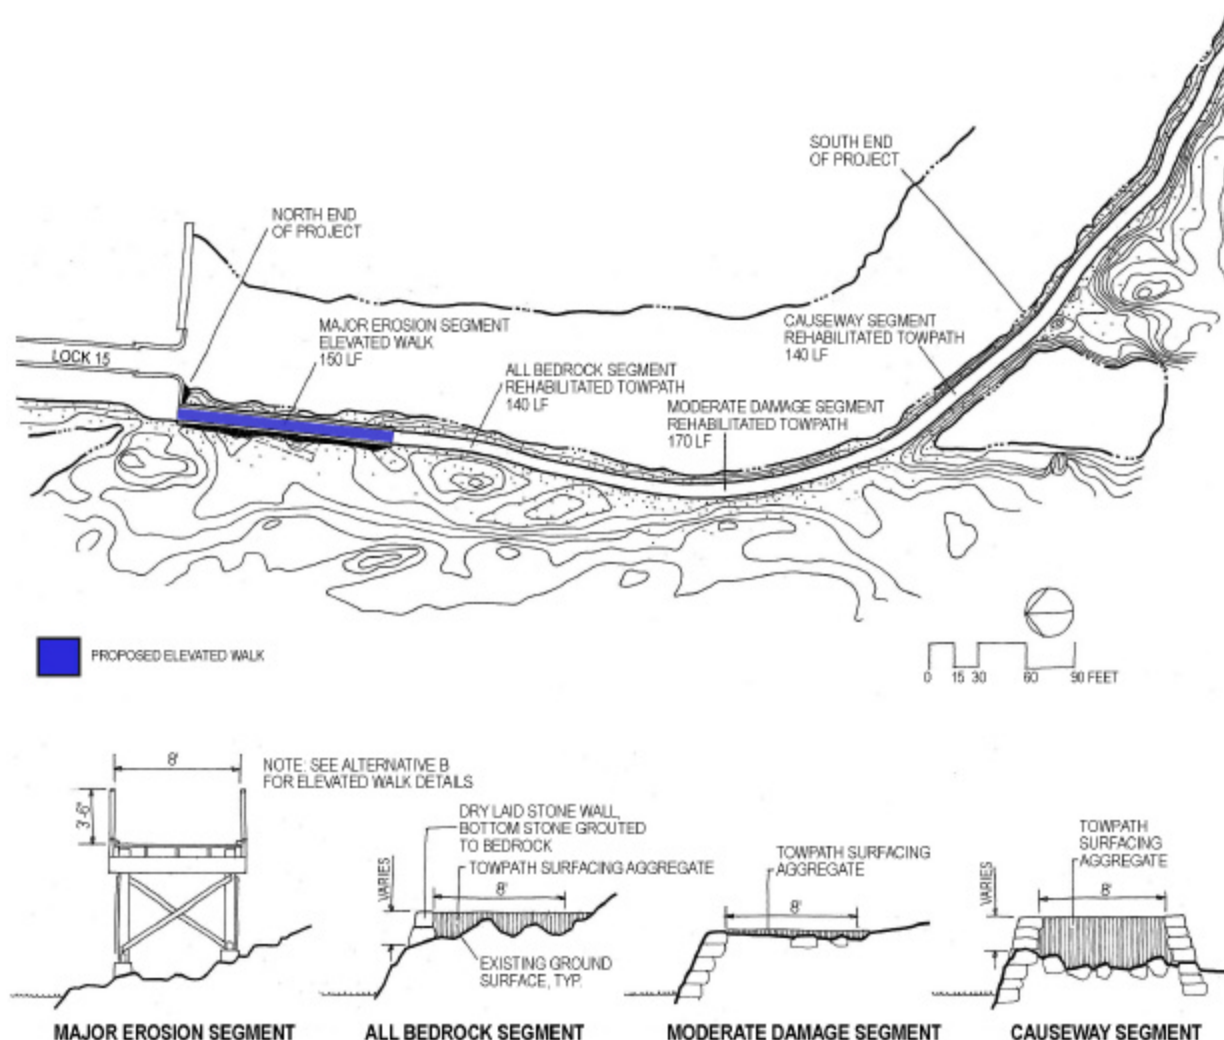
Aerial views and cross-sectional view of Alternative F - One elevated walk segment.
